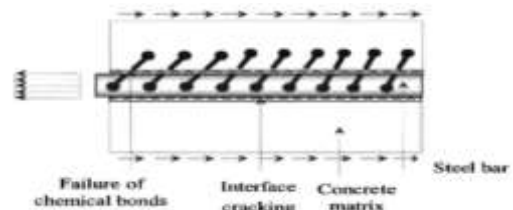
Deformations of concrete around steel reinforcing plain bar after formation of internal cracks
